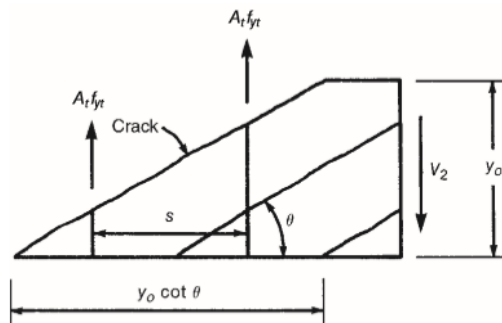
Section of the vertical wall detailing the stirrups force [12].
